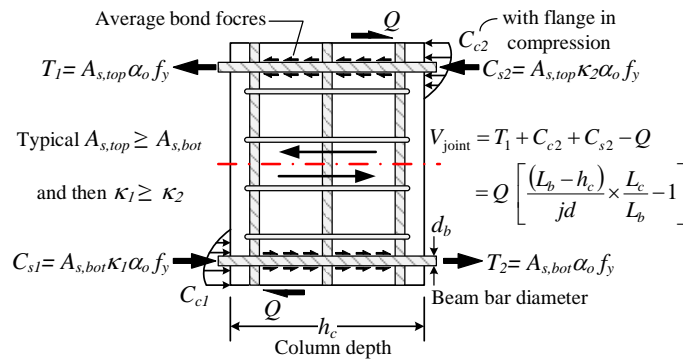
Horizontal shear and bond forces acting on the joint concrete.
